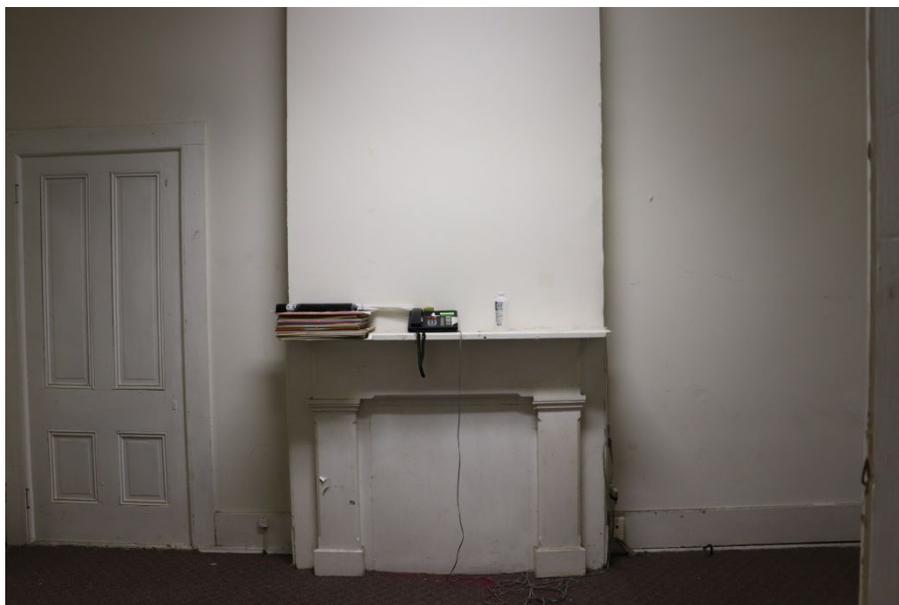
Ell, first floor room. The four-panel door would have previously exited toward the separate kitchen and quarters building, 2023.
